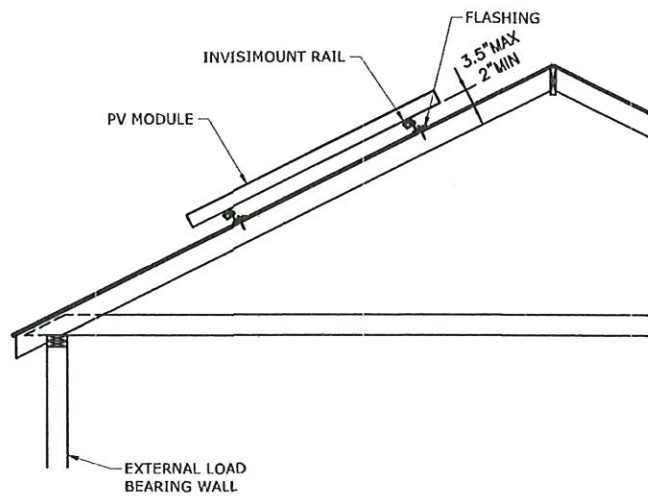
INVISIMOUNT ROOF ATTACHMENT DETAILS @ TRUSS / RAFTERS
